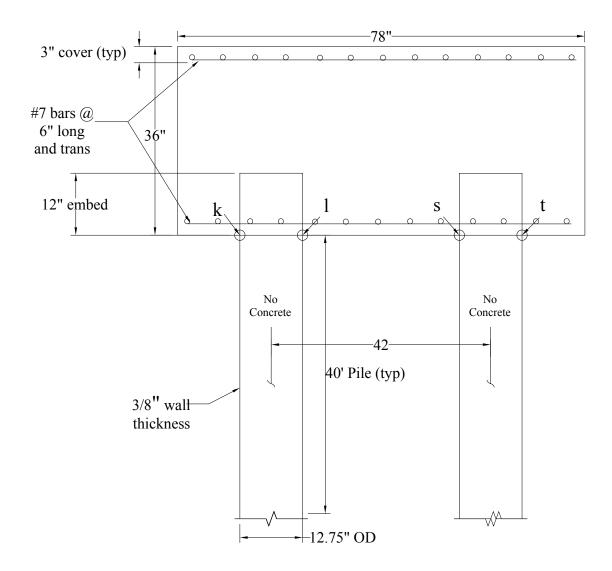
Pile Cap 3 with construction details and instrumentation layout.
